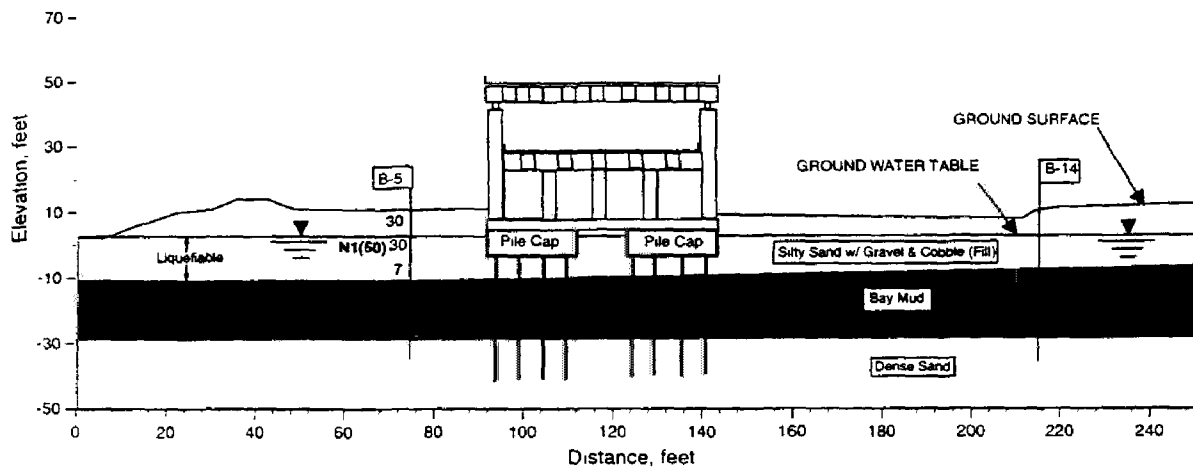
San Francisco - Oakland Bay Bridge east approach cross section (typical).
